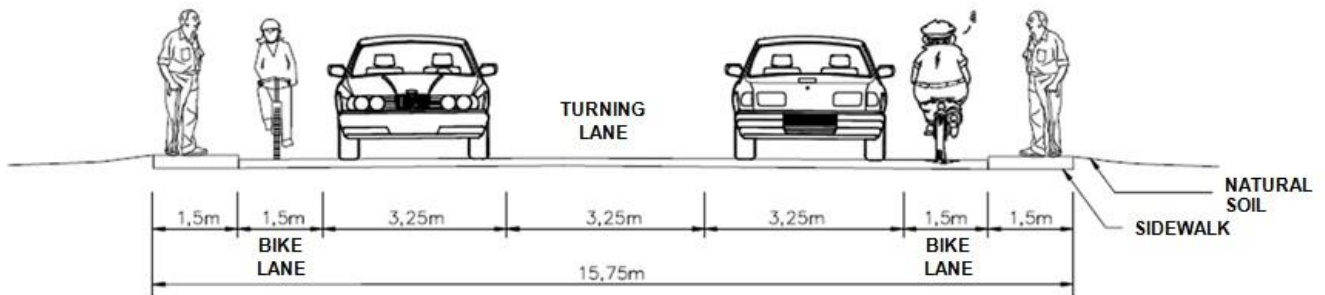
Proposed Cross-section for Old Chelsea Road – with Wider Sidewalk
